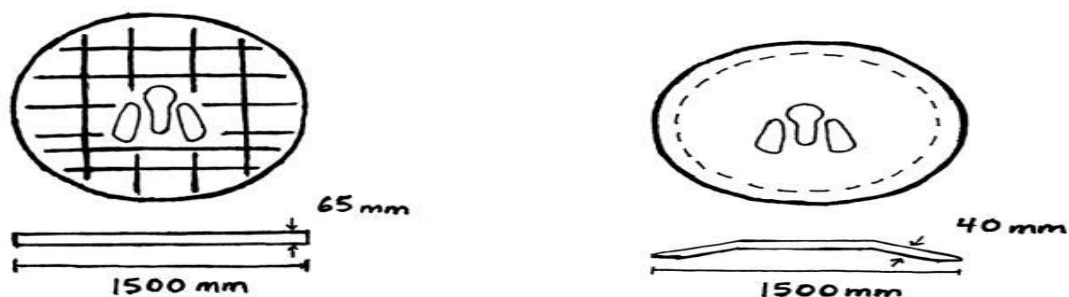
Plan Views and Cross-sections of Reinforced (top) and Unreinforced (bottom) Concrete Slabs (source: Andrea C. Telmo, 2002 in Pickford 1998)
